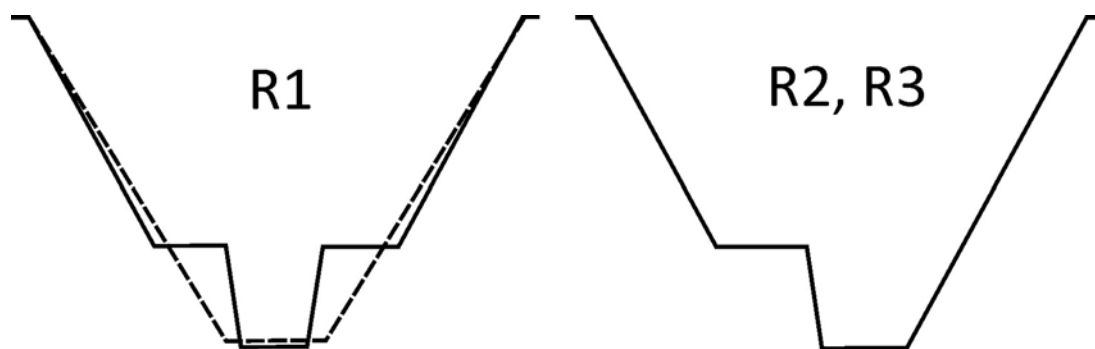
Schematic cross-sections of the trenches. Maximum width on a terrain surface level: 4.5-8 m.
